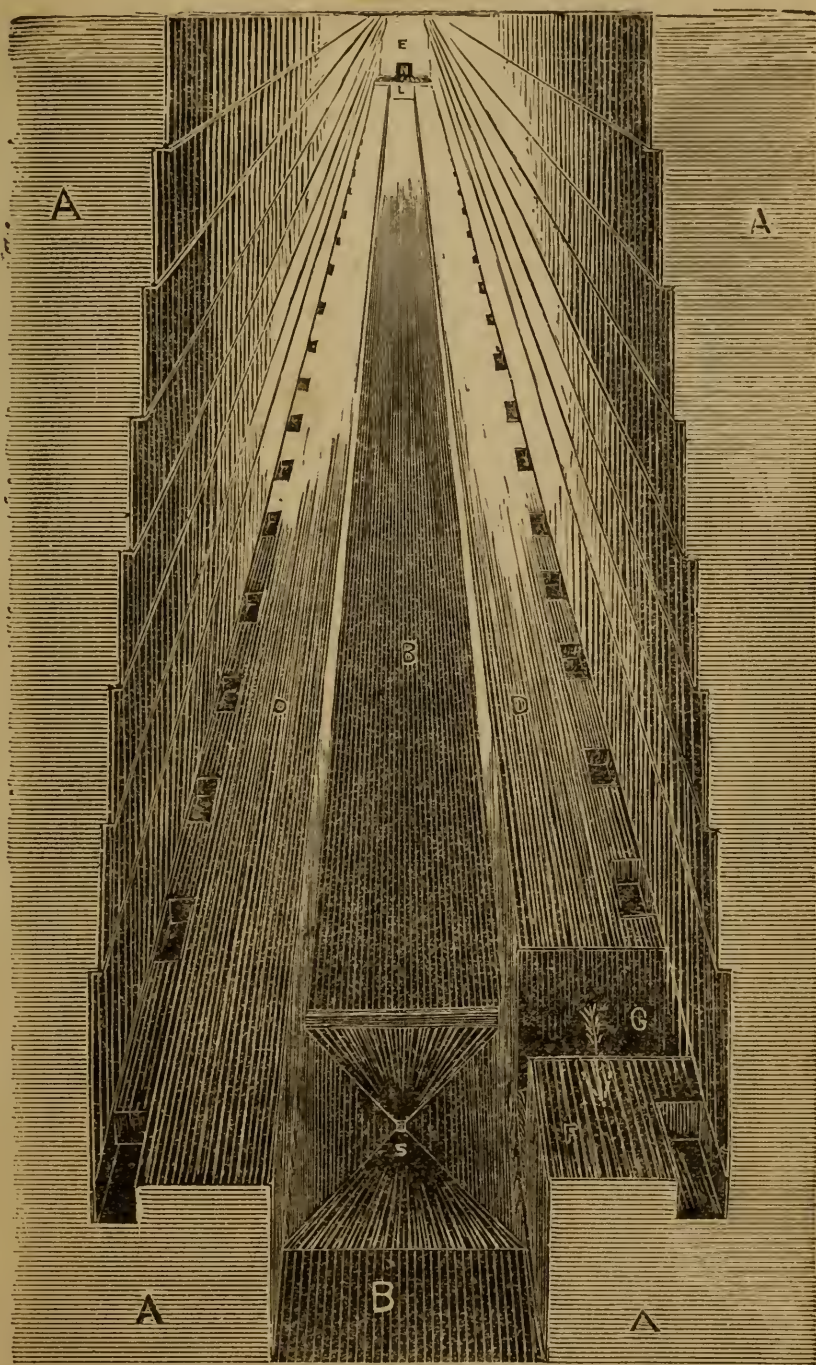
Perspective of Grand Gallery, section at extreme north and lower end. A, Masonry. BB, Floor, interrupted by the horizontal passage, S, to Queen's Chamber. C, Missing Rampstone, arrow leading into the Well. D, Ramps or Benches. E, South Wall. L, Step. N, to Antechamber.
